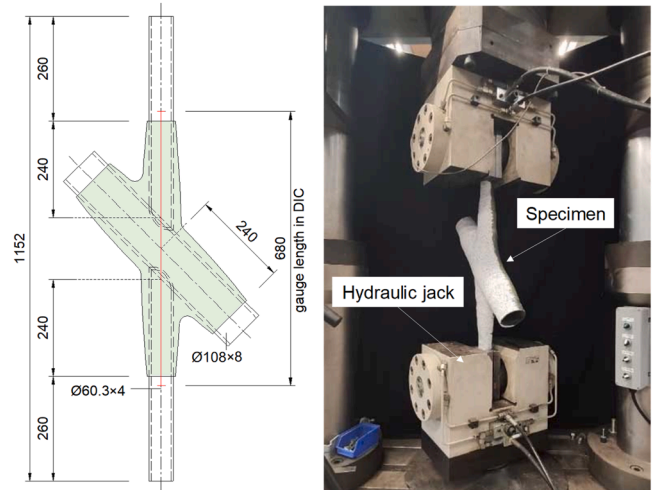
Specimen dimensions and test set-up of small scale joints.
